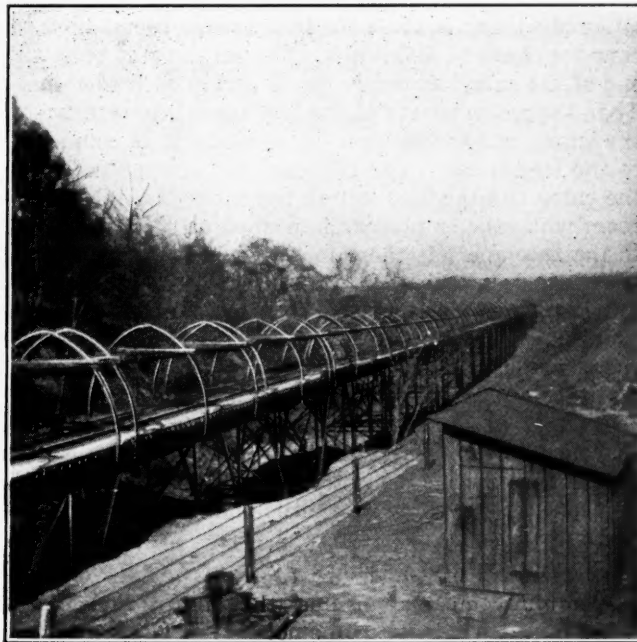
VIEWS OF STEEL TRESTLE CONNECTING VESTA NO. 4 TIPPLE WITH THE MINE
